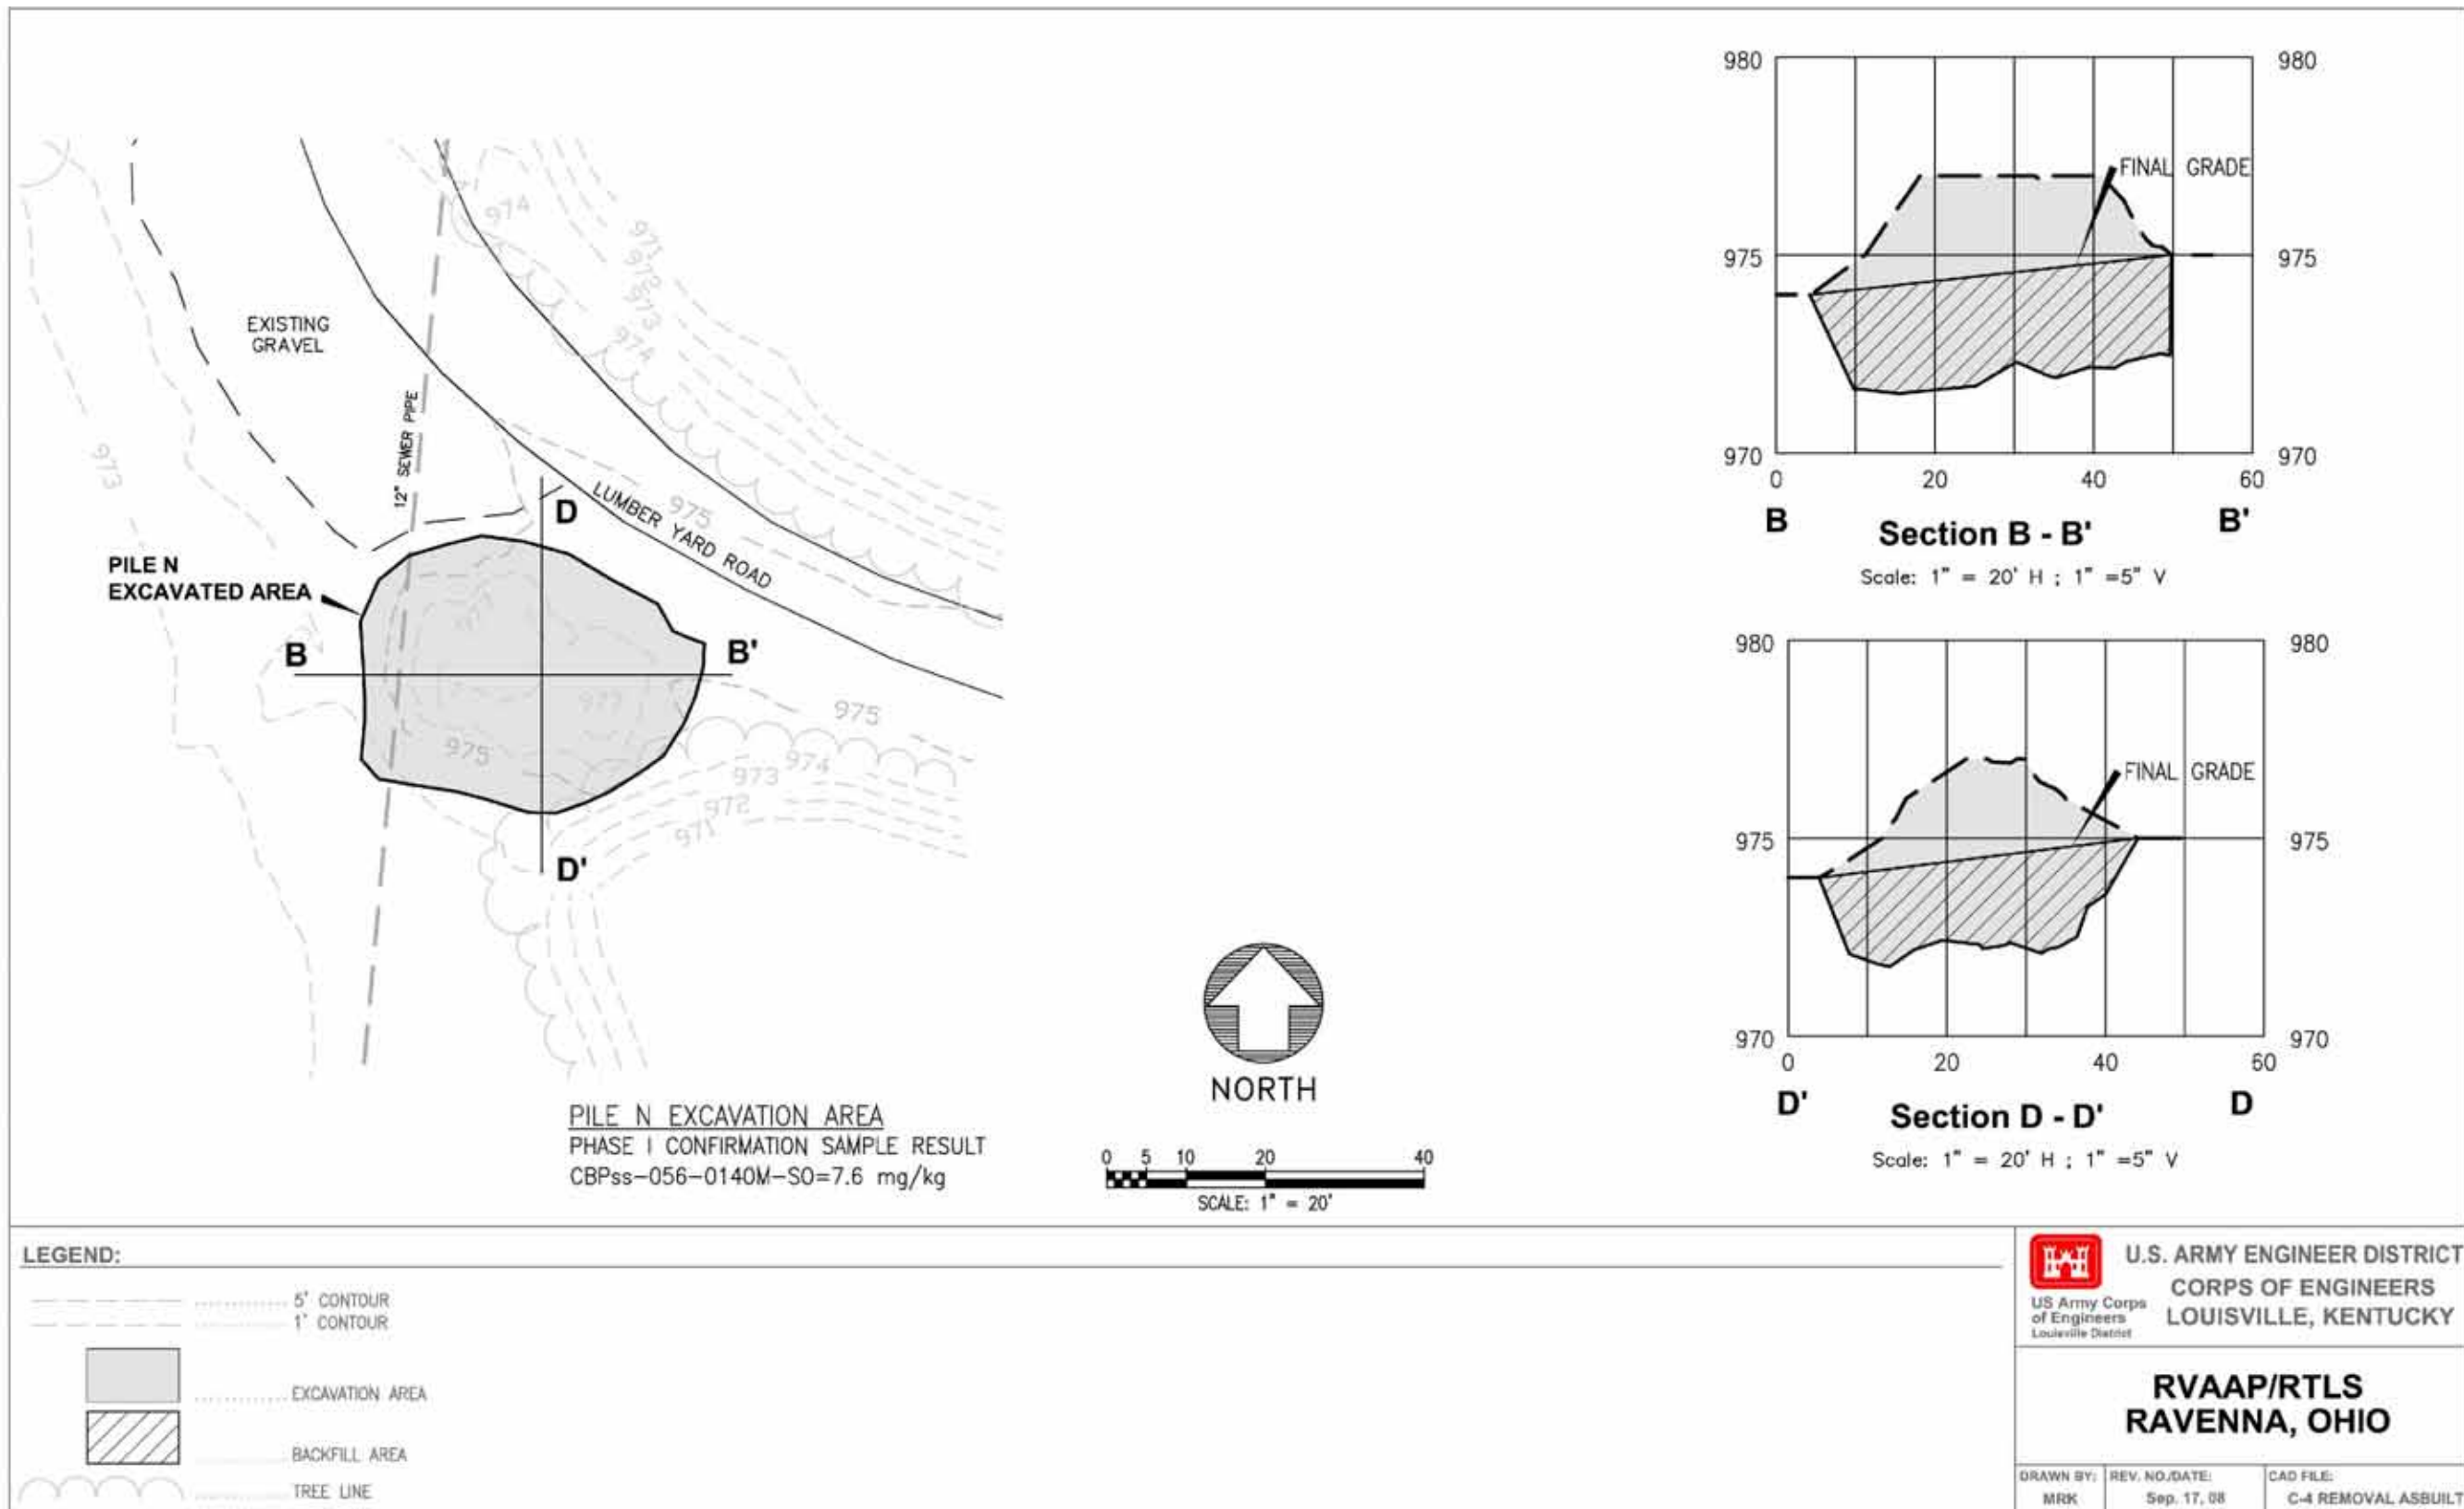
Pile N Final Excavation (Plan and Profile View)
